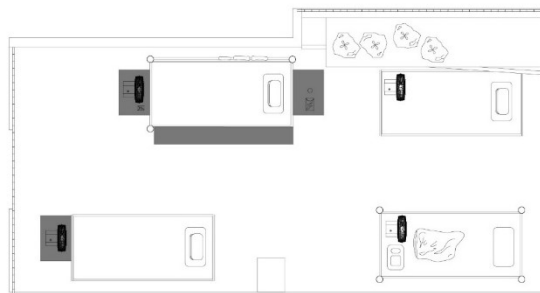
Bedroom plan indicating plywood bed extensions for object placement
